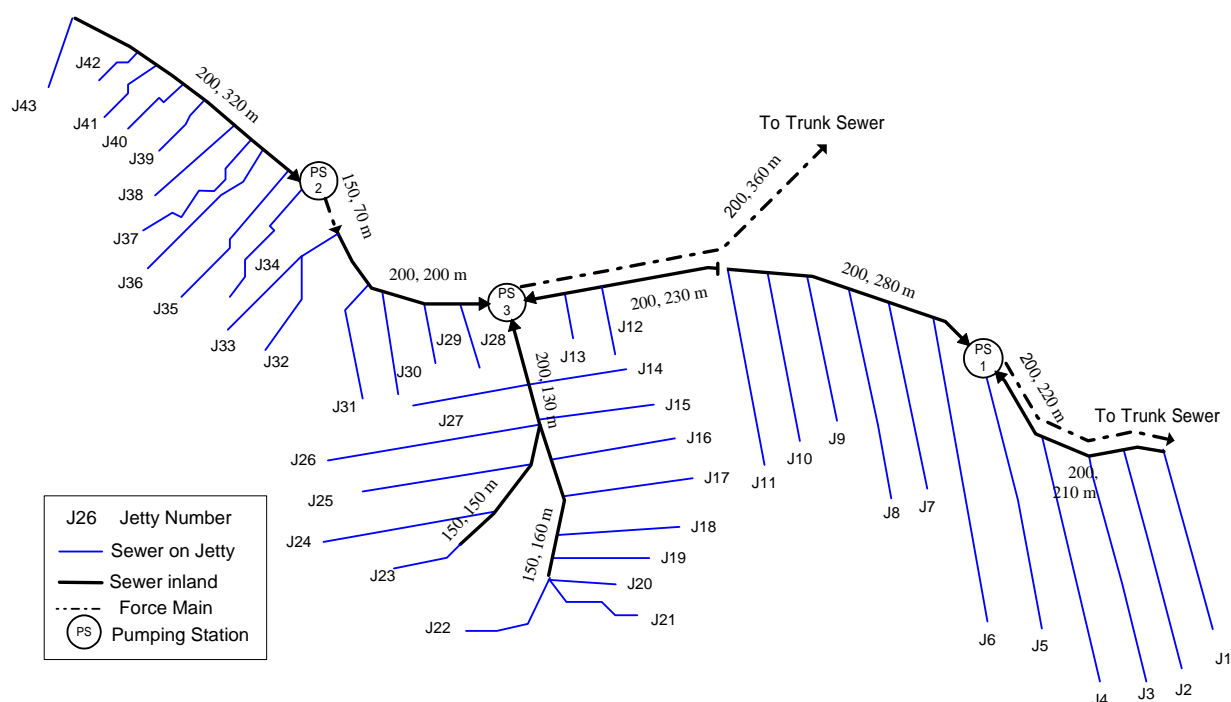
Sewerage Master Plan in Hanuabada Village
